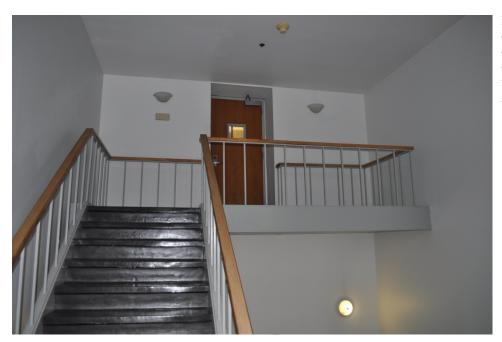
1965 exit stair within original President's office,; at fourth floor level; 2011. *Photo, Beth Grashof.
